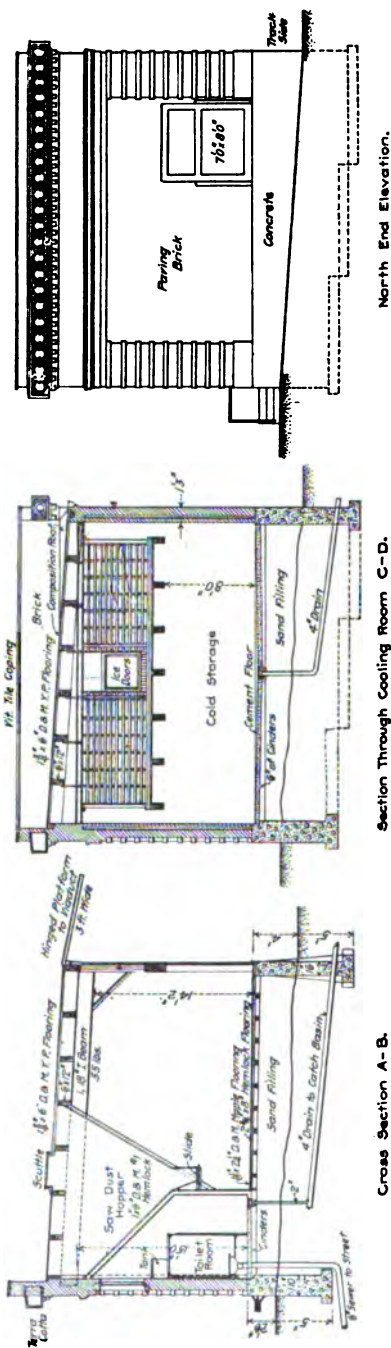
End elevation and cross-sections of freight-house, Chicago—Baltimore & Ohio.
